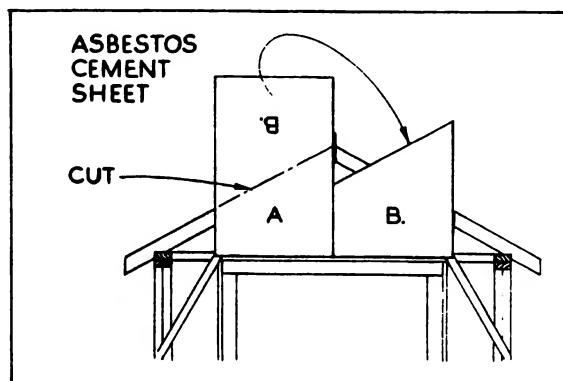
Cutting A.C. Sheets for the Gable Ends.
